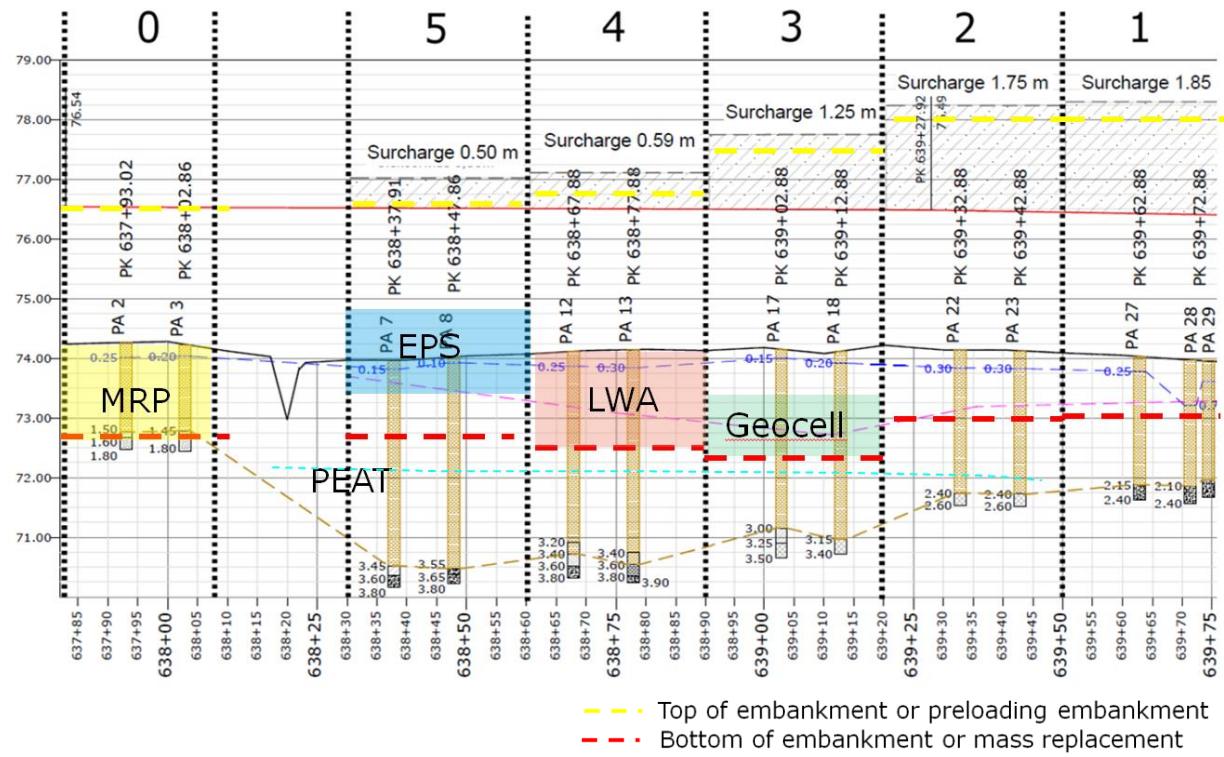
Vertical location of the georeinforcements, geocell, LWA and EPS based on settlement measuring results until 03/2016. In sections 1 to 5 the lowest reinforcement is at the bottom of the embankment (red dash line).
